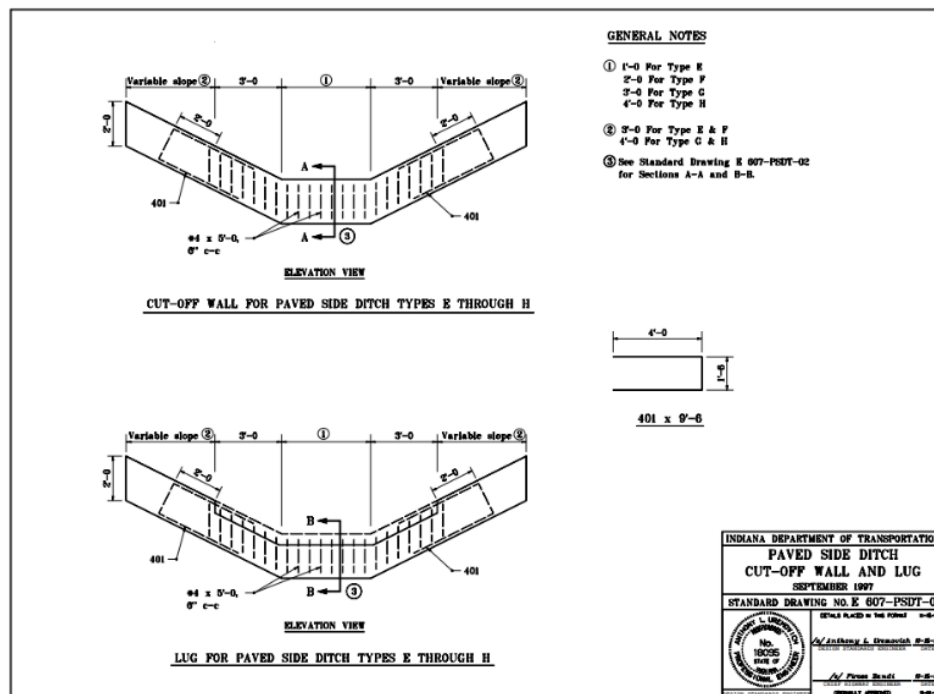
Paved Side Ditch Cut-off Wall and Lug (E 607-PSDT-03)
